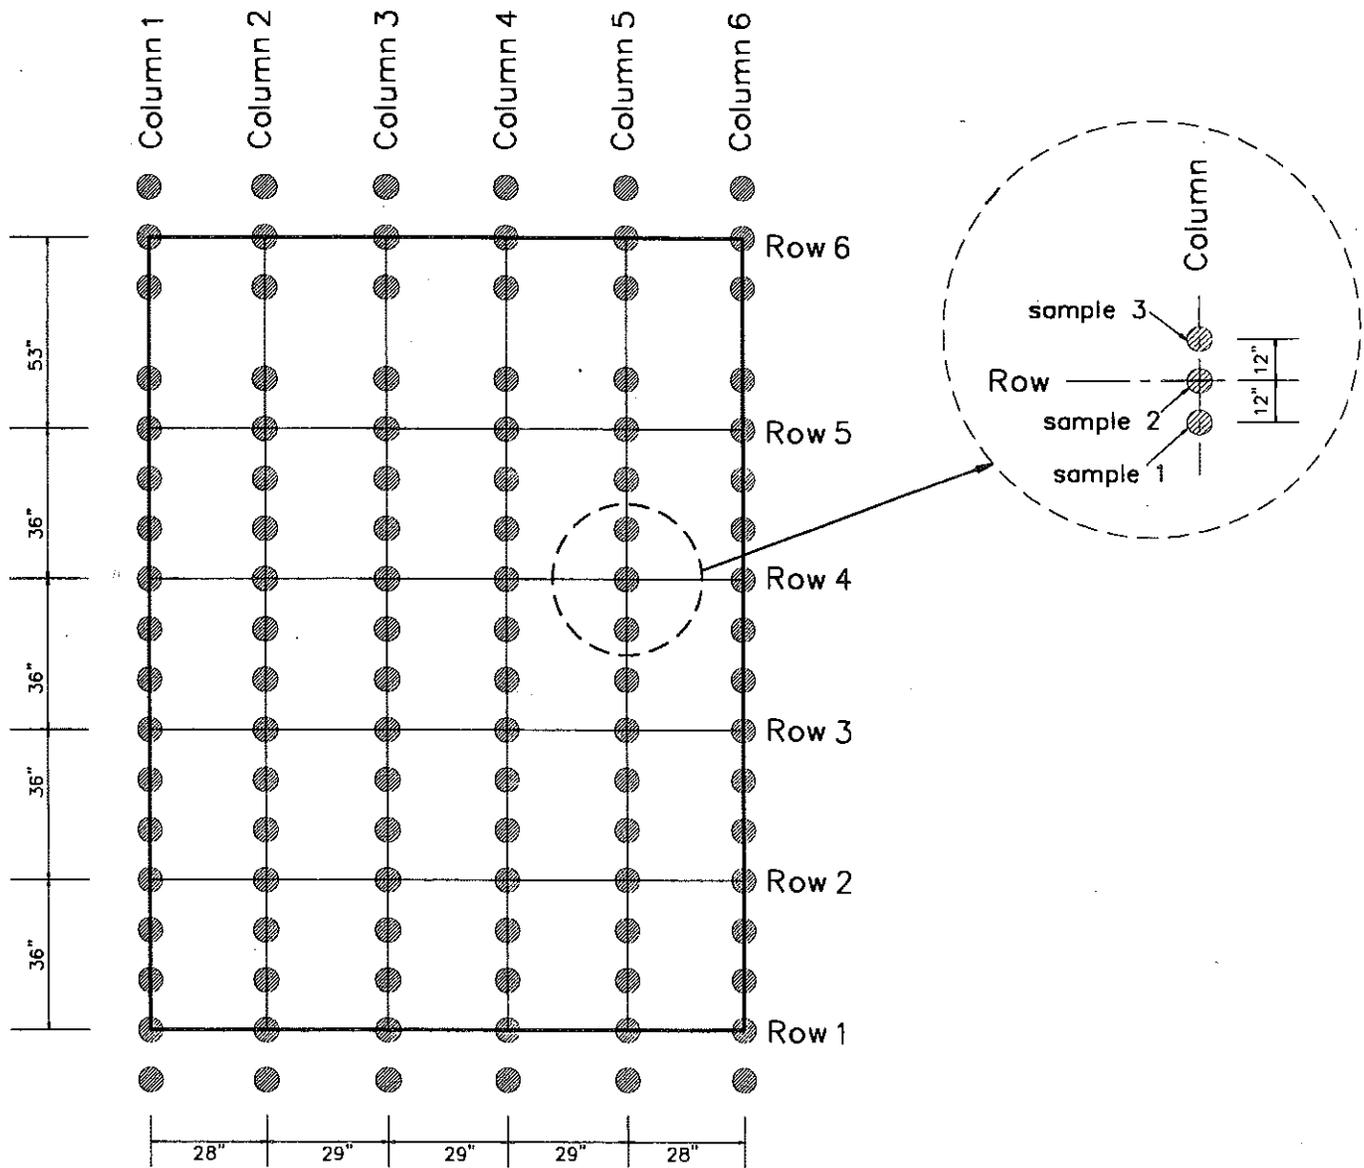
Layout of Sampling Grid at Site 7 - Lansing State Police Facility
